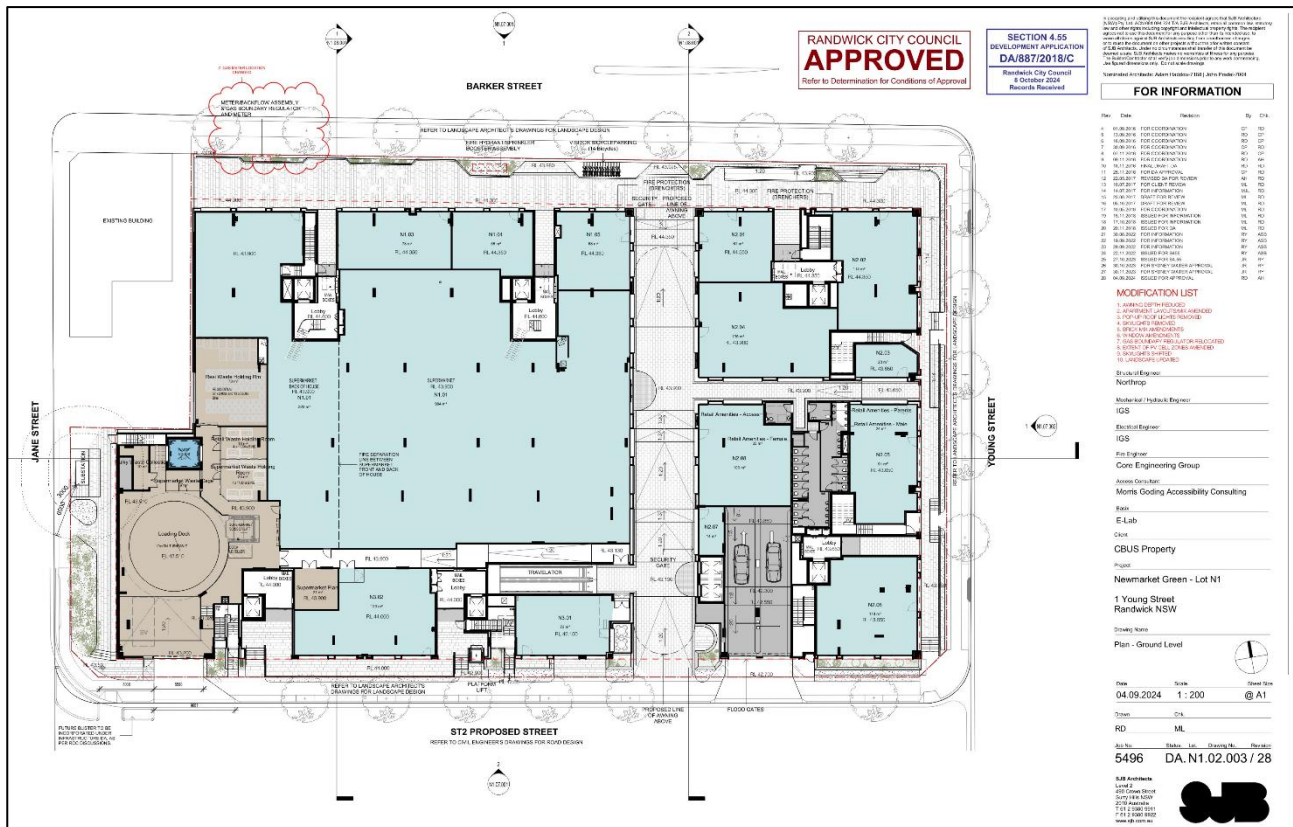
Ground floor plan for the Newmarket Green development at 1 Young Street (Source: SJB Architects, dated 4 September 2024, DA/887/2018/C)
